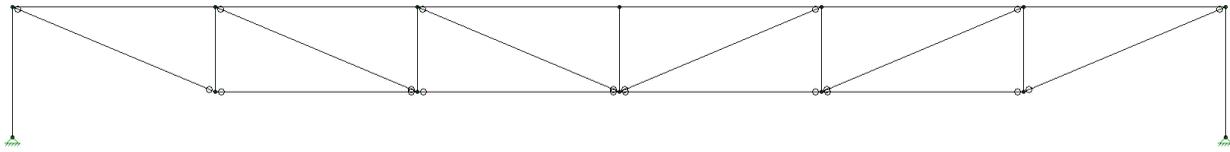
Underslung Howe Truss Alternative Elevation View
